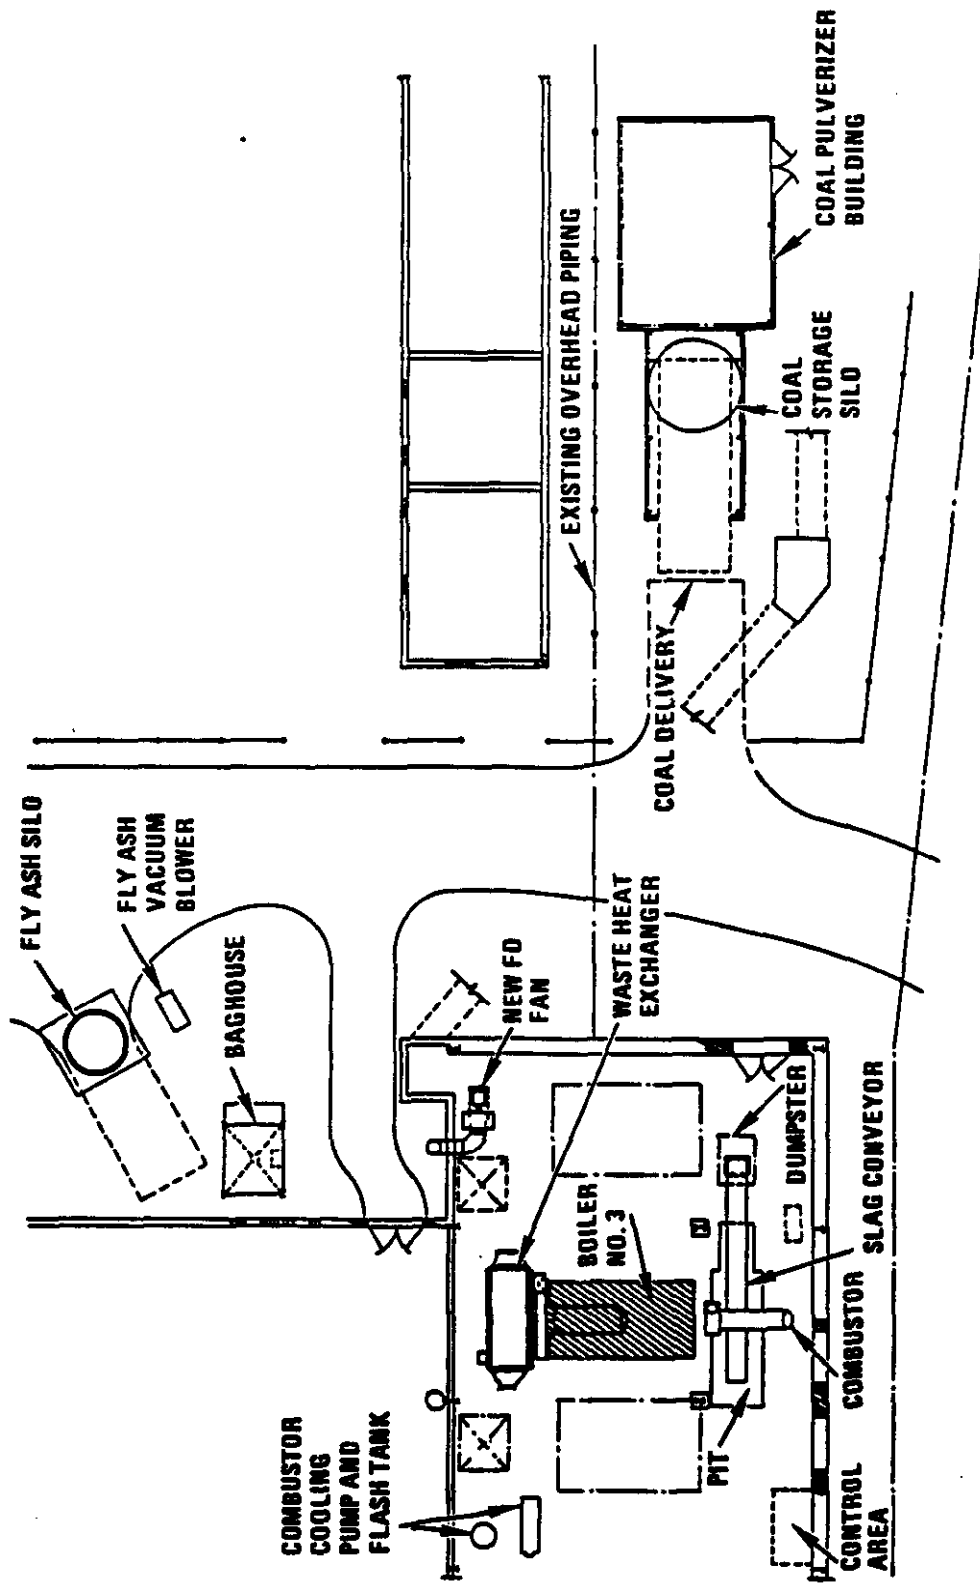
PLAN VIEW OF THE CLEVELAND TEST FACILITY
